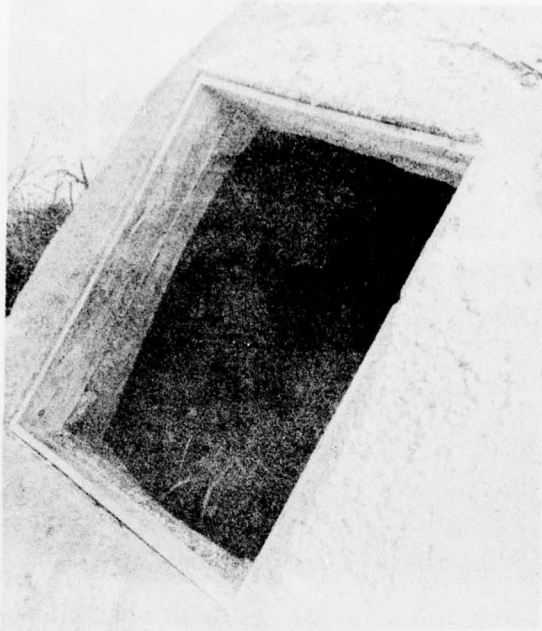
Opening into 15-ft (4.6-m)-diameter by 7-ft (2.1-m)-high dome made by placing wood form directly on the foam shell and then shotcreting around it. Cover of form has been removed.
